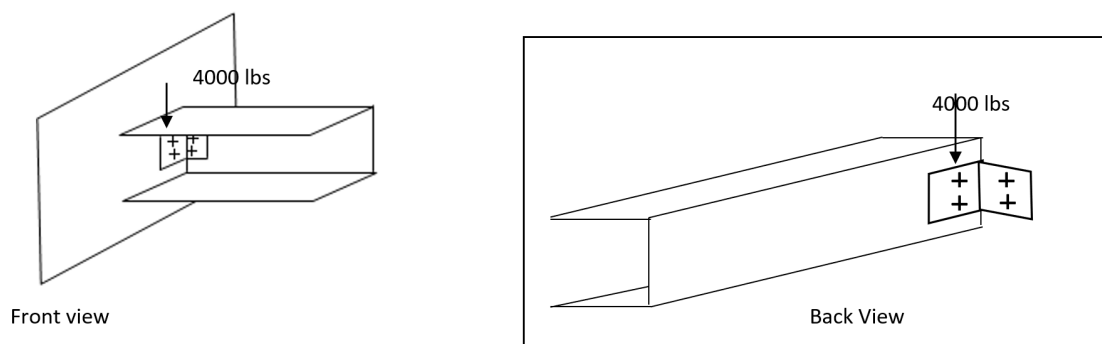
Problem 2: Plate and channel beam connected by a shear clip front view (left) and back view (right)
